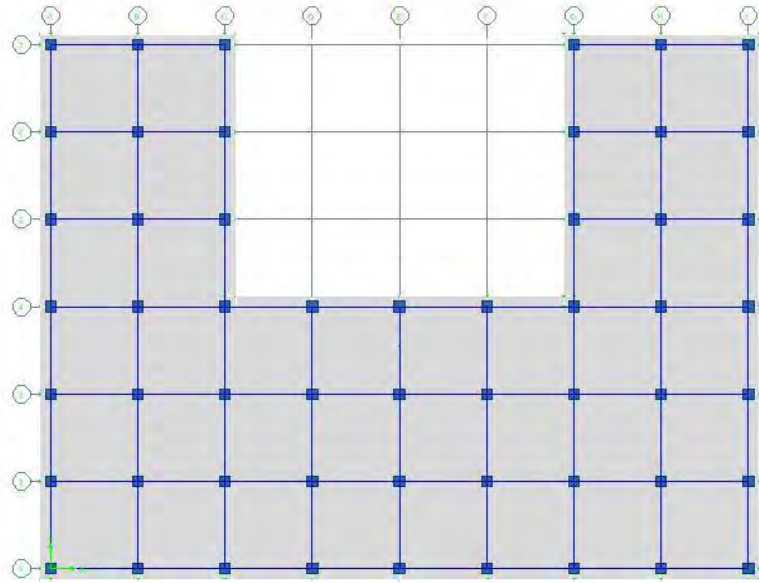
Column, beam and slab of non-uniform structure from story 8 to 25.
